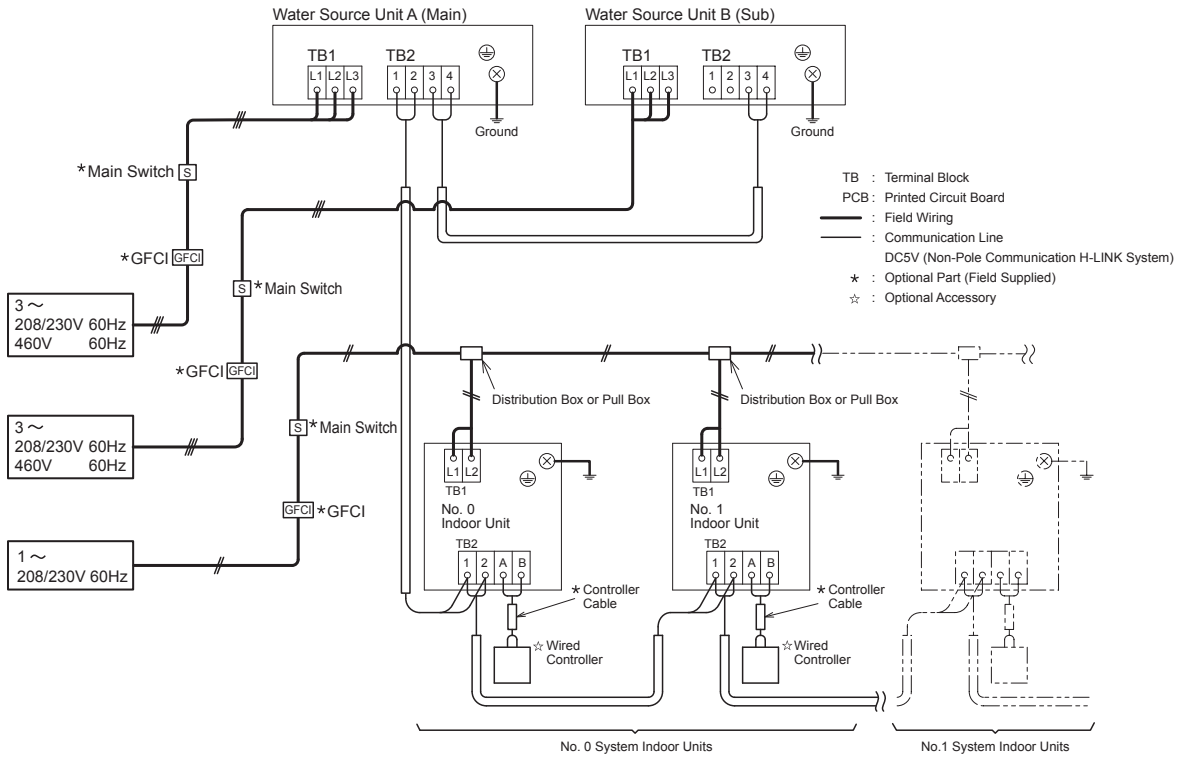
Layout for Electrical Wiring Connection (Heat Pump System)
